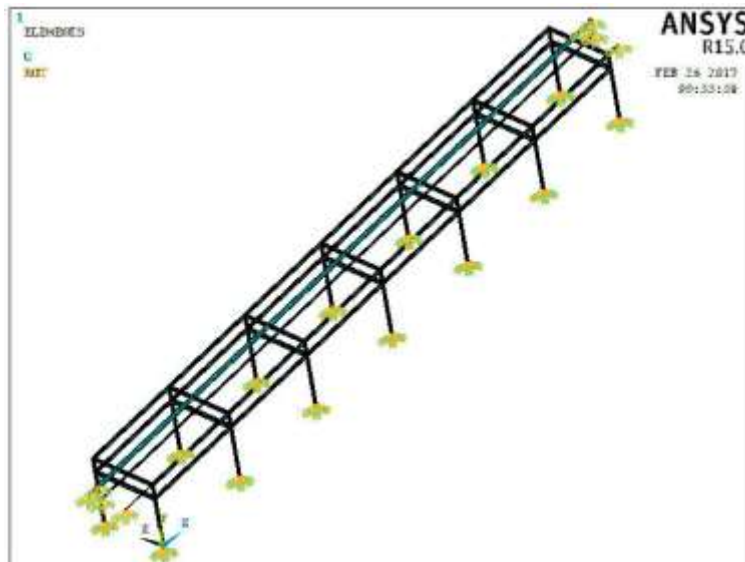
Steel pipe supporting structure with span lengths 8 meter and pipes 70-102-159-324 located on it.
